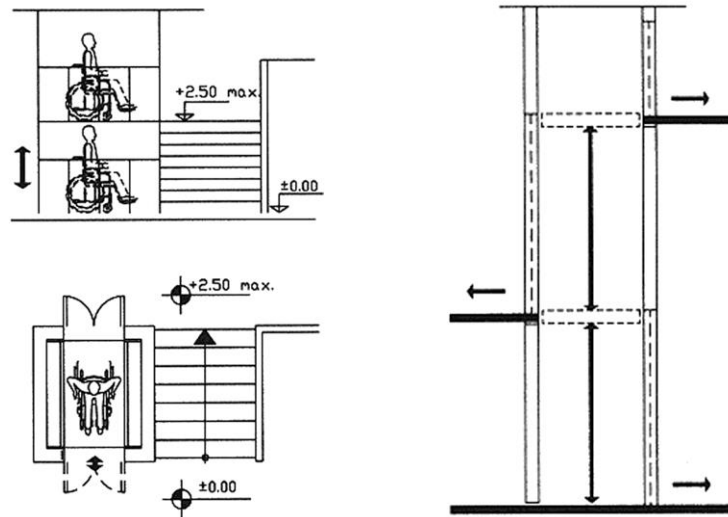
Lifts Plan and Elevation (Goldsmith, 2000, p.65)
